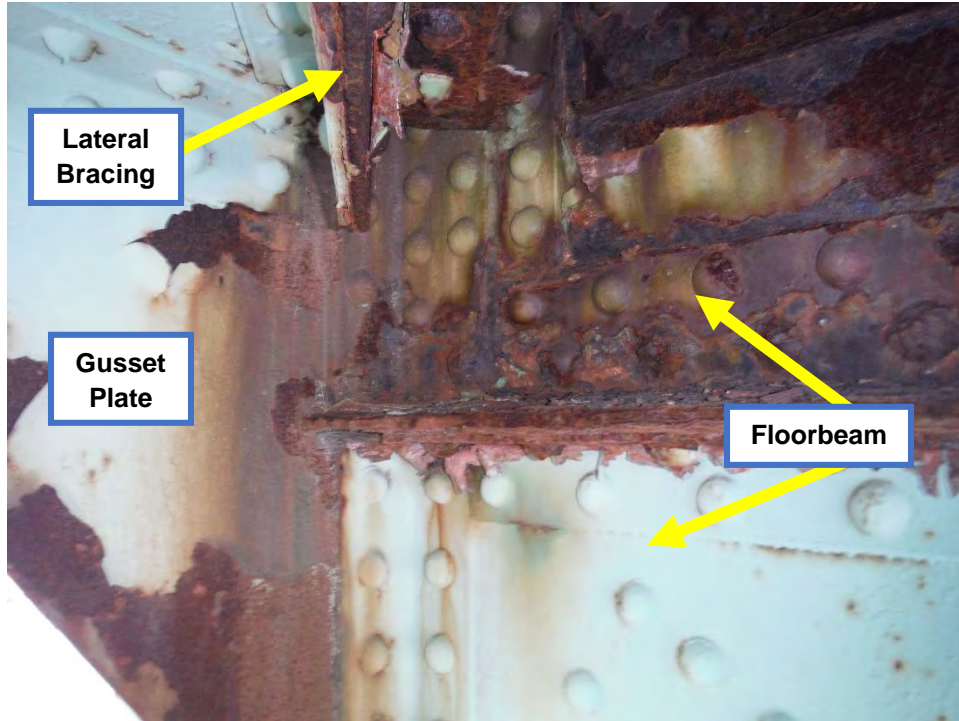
Span 6 Floorbeam (Panel 0') – Section Loss at Truss Connection
